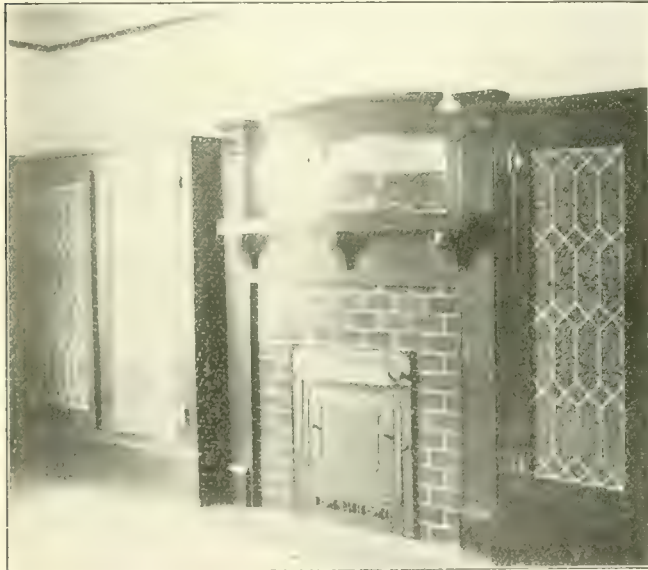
Bookcases and mantel installed by Shaw Bros. in house built by them at 345 Spadina Road, Toronto.
